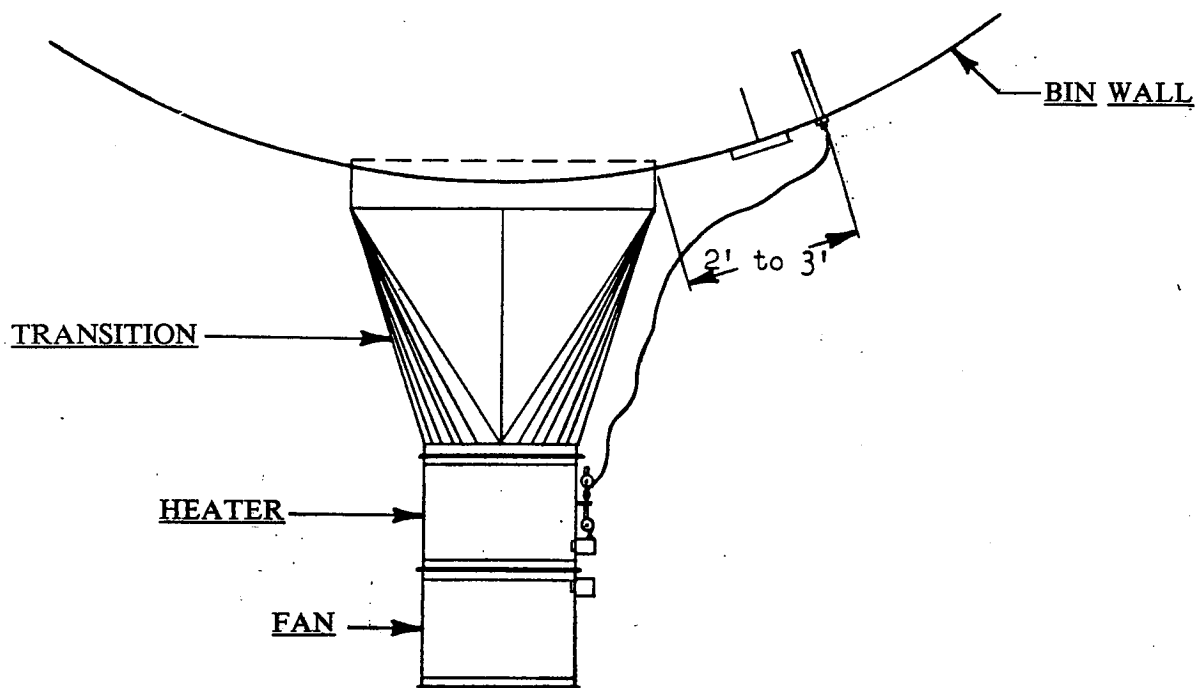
HEAT SENSOR INSTALLATION DETAIL
